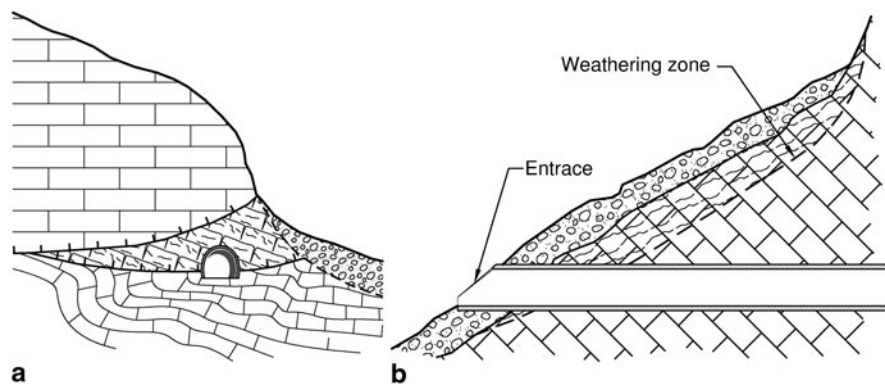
Examples of a geological structure potentially interested by excavation interactions with the slope stability: a Overthrust zone, b portal stretches
